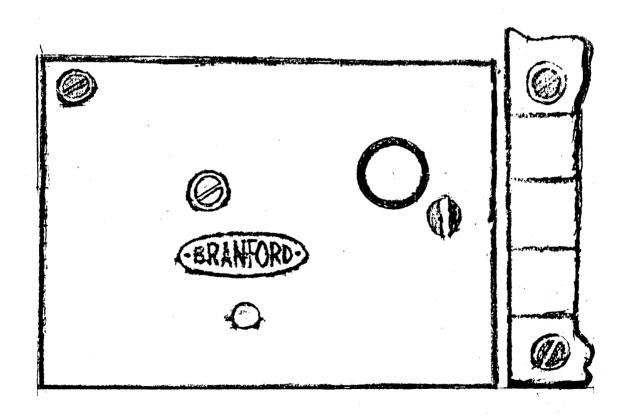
LOCK FACING, EXTERIOR DOOR OF THE SOUTHEAST BEDROOM
